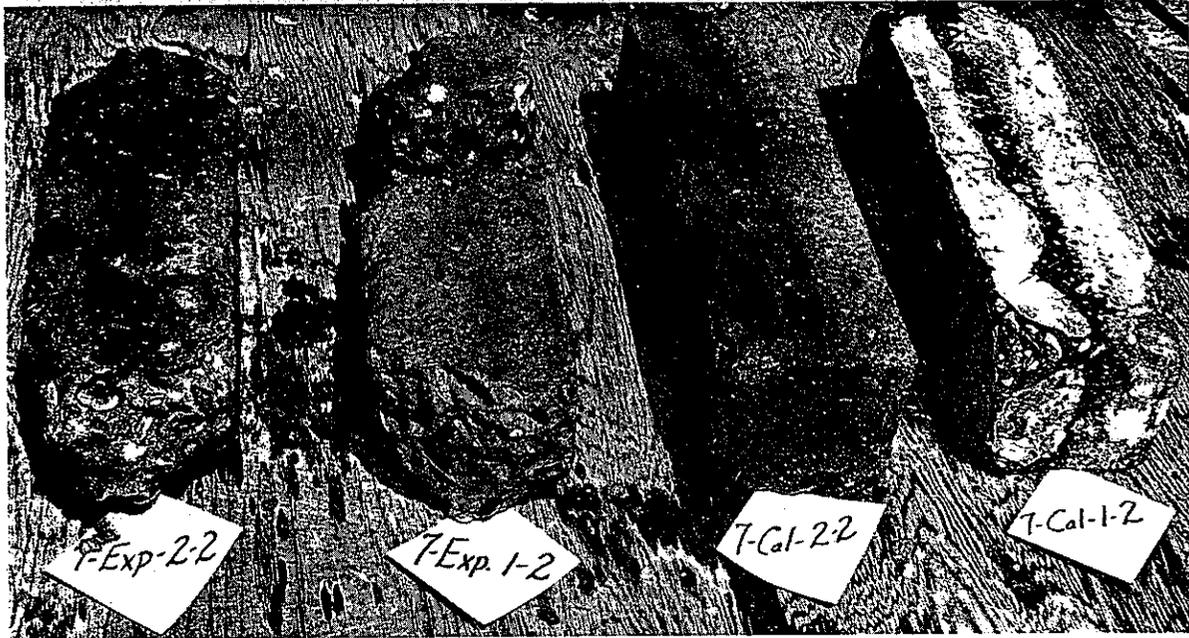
7-sack concrete after 30 months sulfate exposure. Shrinkage compensated cement beams on left; Type II cement beams on right.
